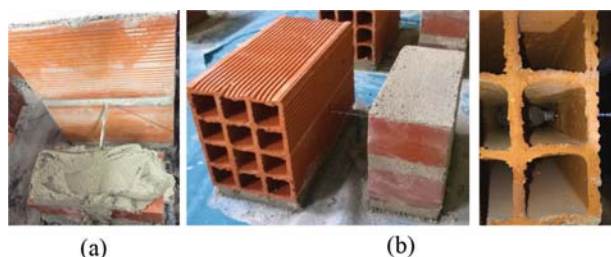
Construction details of the specimens (a) wall ties on brick veneer leaf; (b) T5 wall tie attached to brick masonry leaf.
